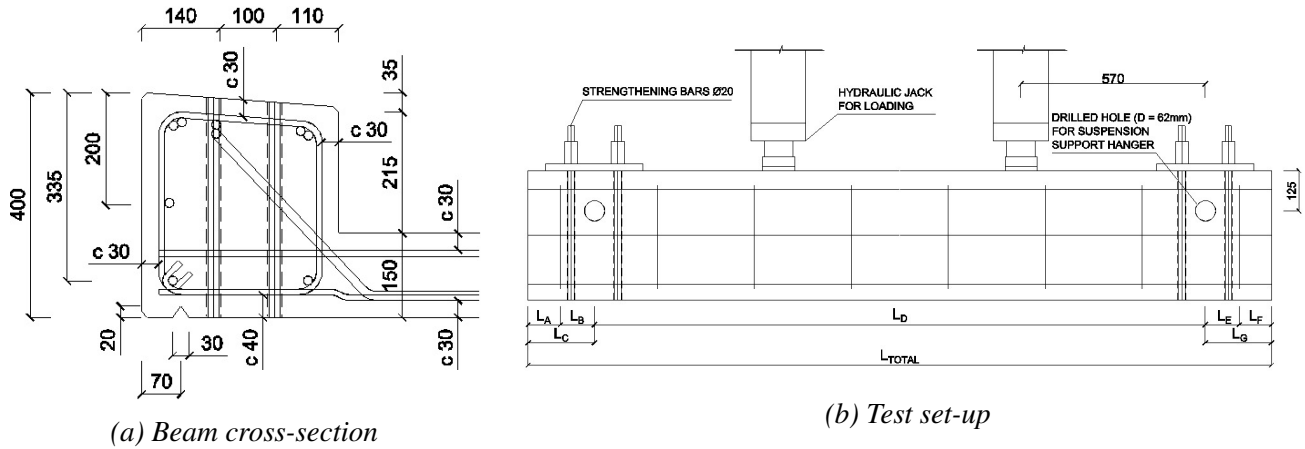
Cross-section and test set-up for the experiment of the beam from Stallbacka bridge (Tahershamsi et al., 2014)
